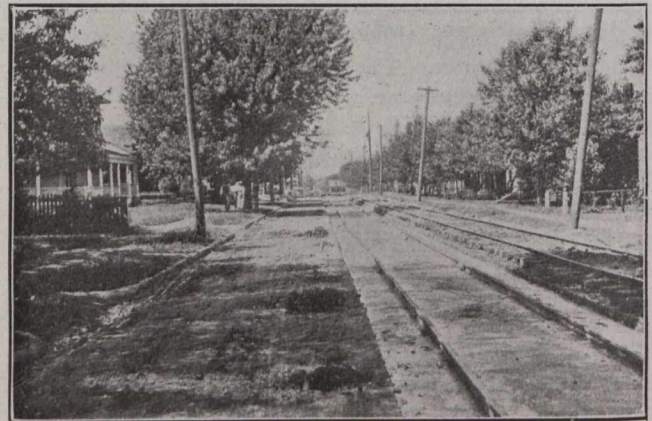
Concrete and Track Work Complete, Ready for Brick Paving.
